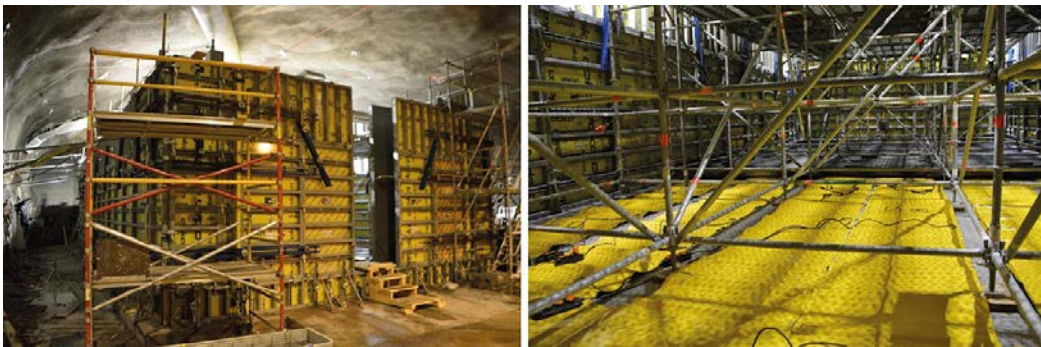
Wall formwork and heating mats used to heat the base slab prior to casting of the walls.
